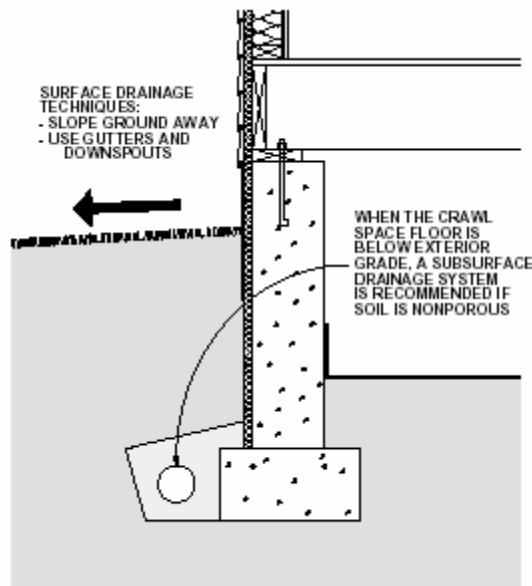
Crawl Space Drainage Techniques (surface & subsurface drainage)
